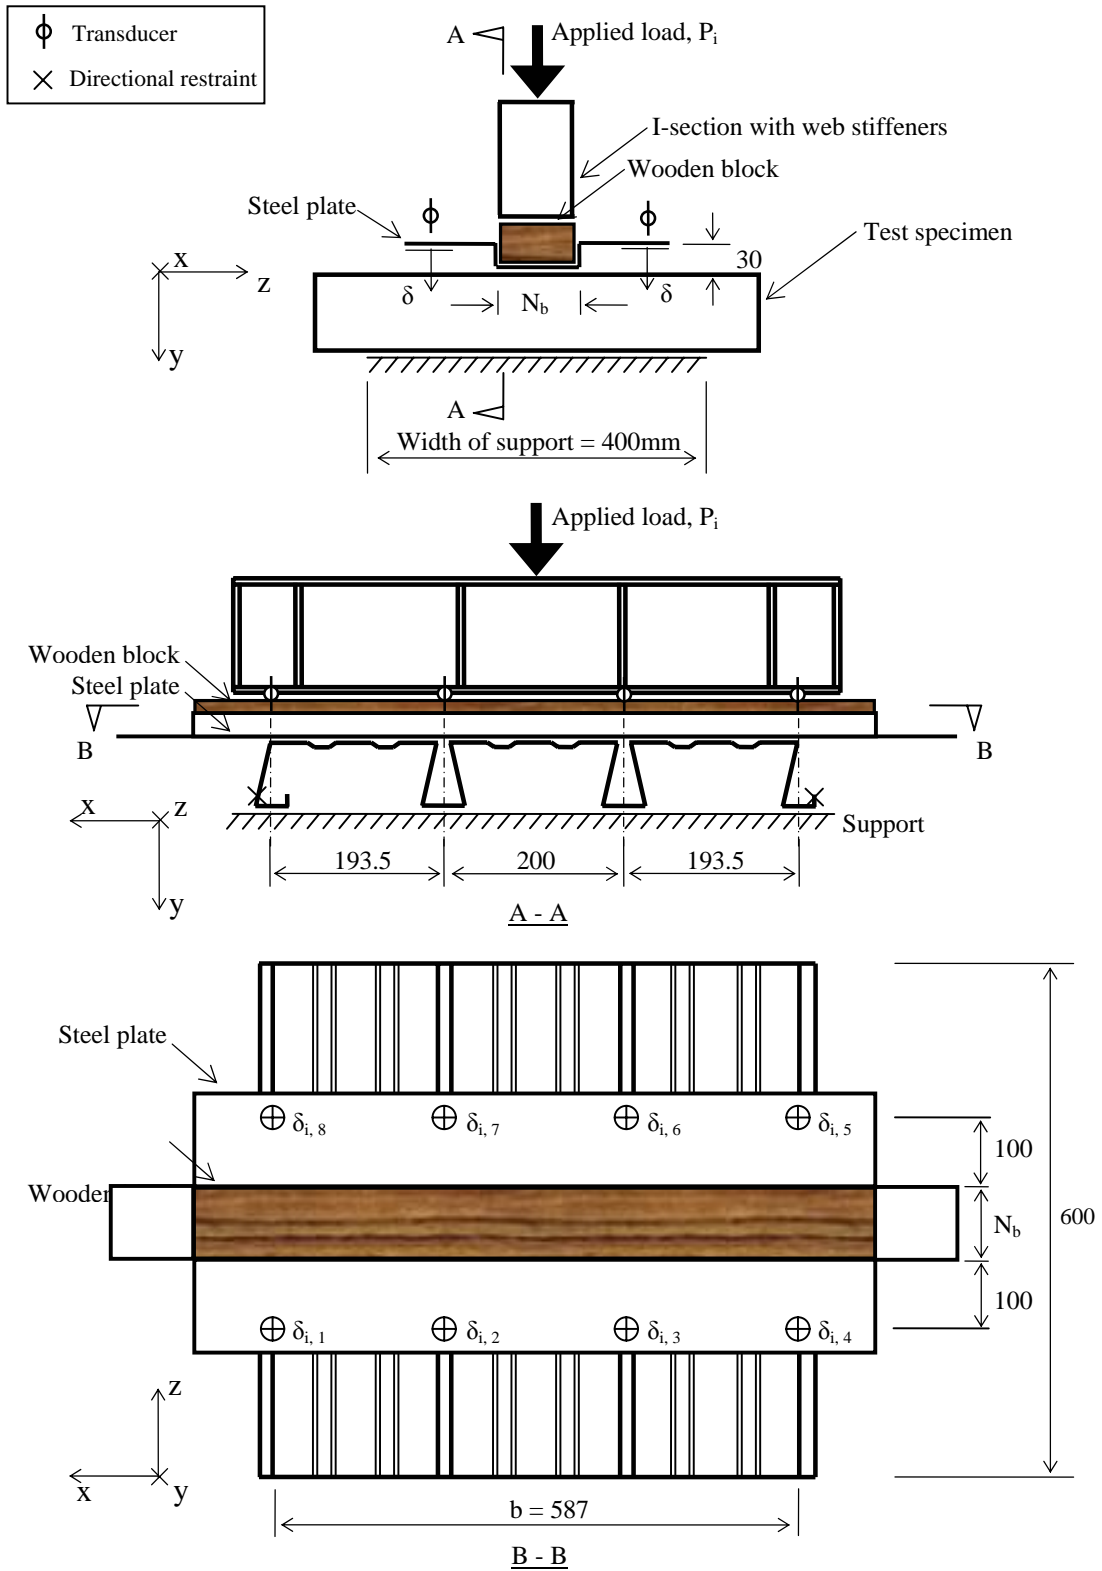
Typical set-up of web crippling test under internal loading condition with detailed instrumentation.
